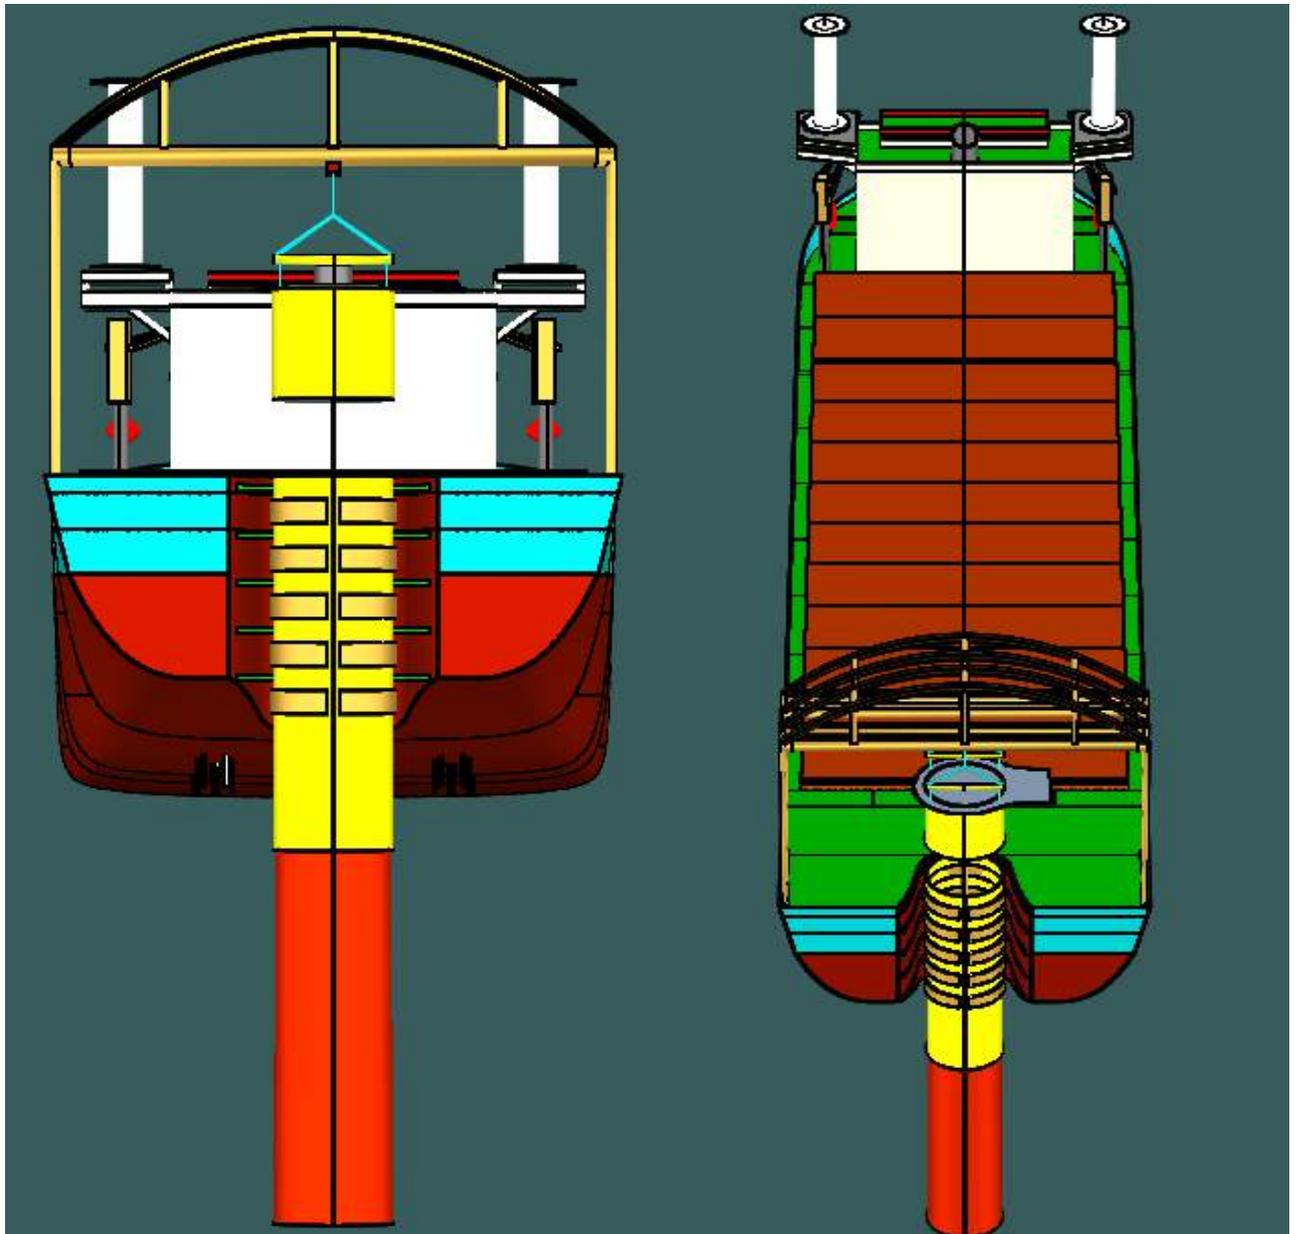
Back and Birds Eye View of Lifting the Cut Section of TP
